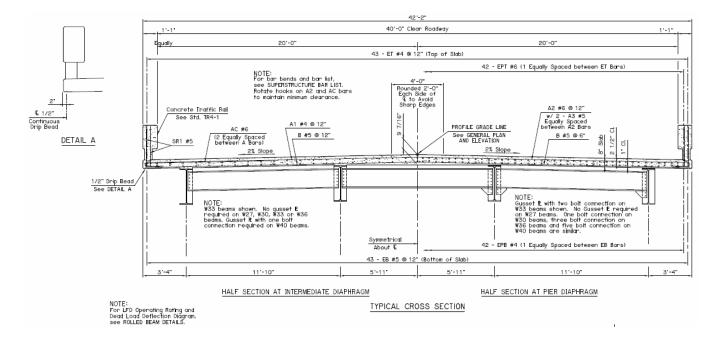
Oklahoma Standard Bridge Cross-Section Design Aid
